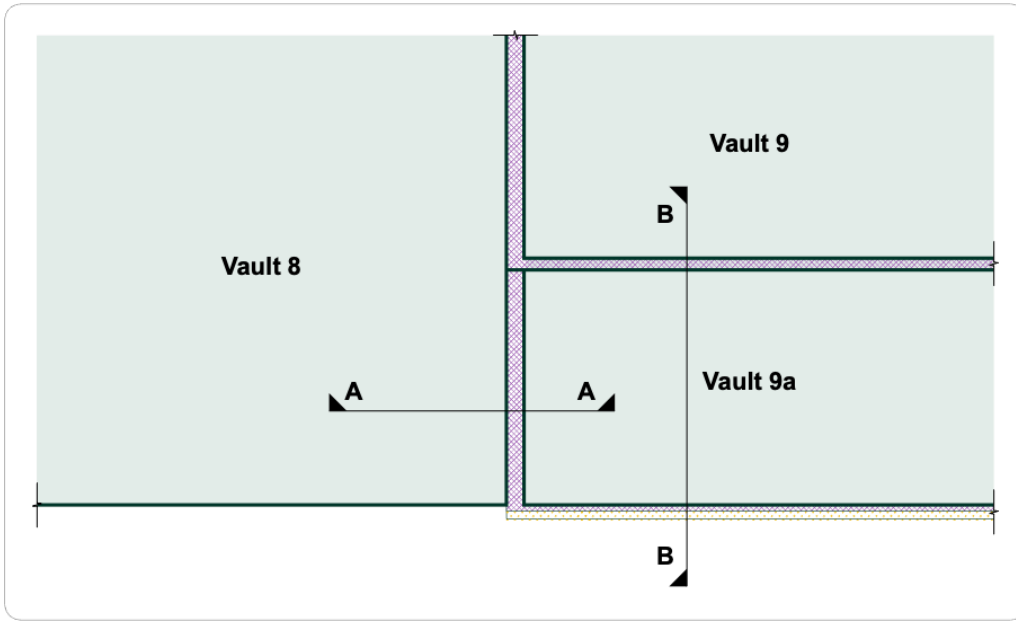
and Figure 5.13 show a schematic plan and sections. With construction of Vault 9a, the leachate drainage system will be revised as indicated in Figure 5.14. The system will have the 1 m high 'spill over' level to basal drainage. The optimum arrangement will be subject to further detailed design.
